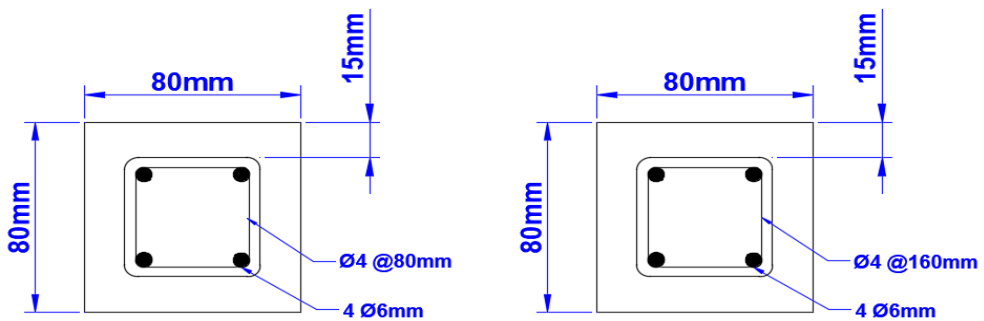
Cross-section of reinforcing steel in square NSC columns.
